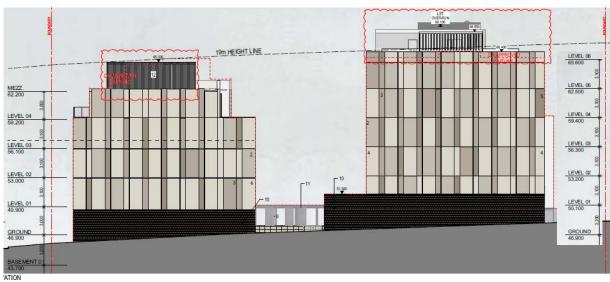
Proposed western elevation (proposed changes clouded in red)
